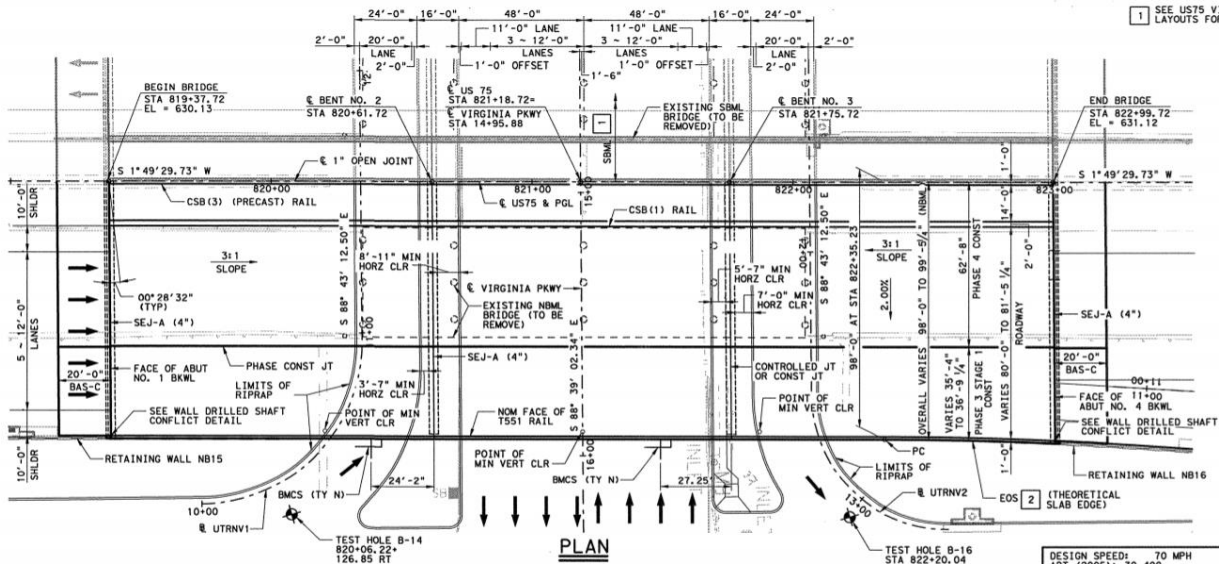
20: Plan view of span 1 in Virginia Parkway bridge
